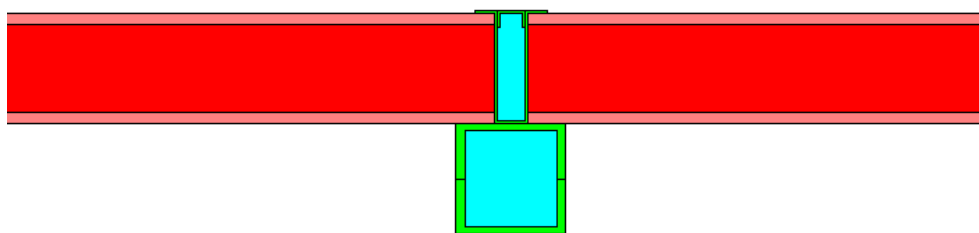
SECTION OF THE VERTICAL WALLS
